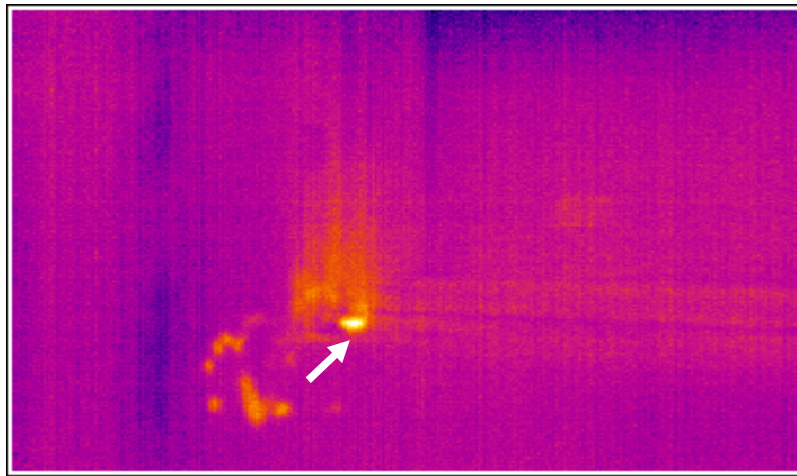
Southwest Top Corner – Infrared (Iron)
